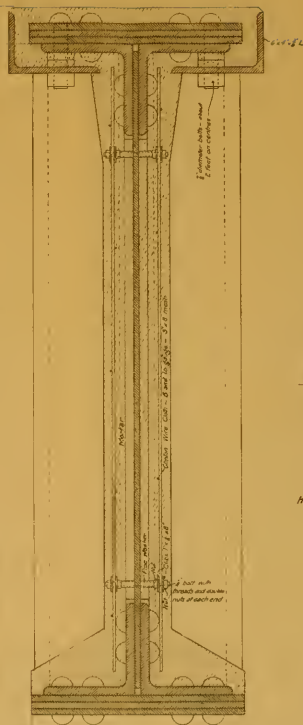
NEW CITY FLOOR BEAM WITH CONCRETE PROTECTION COMPLETED.
